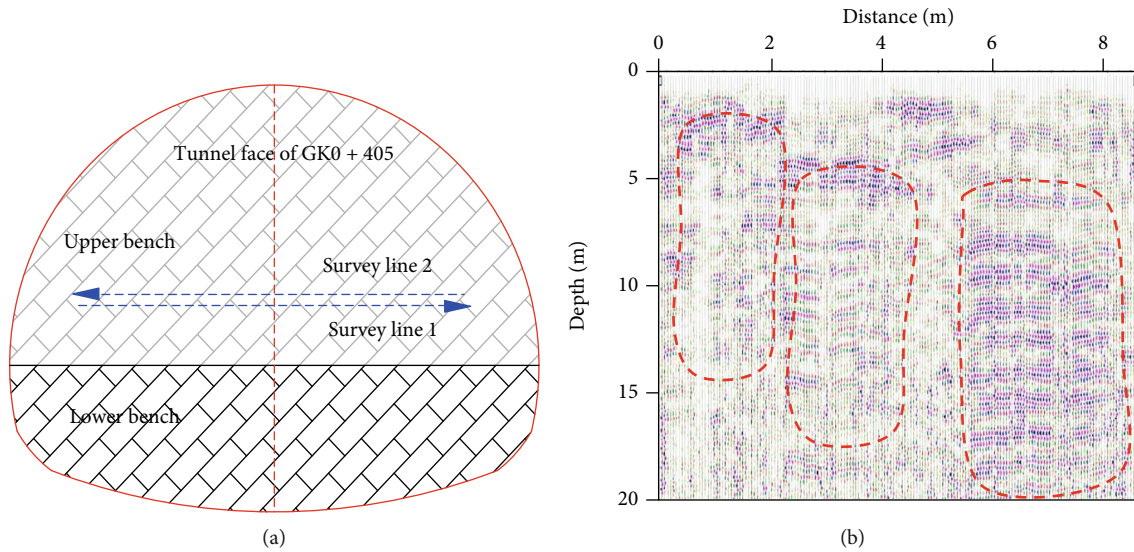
Tunnel face geological radar detection: (a) layout of survey lines in the tunnel; (b) detection result.
